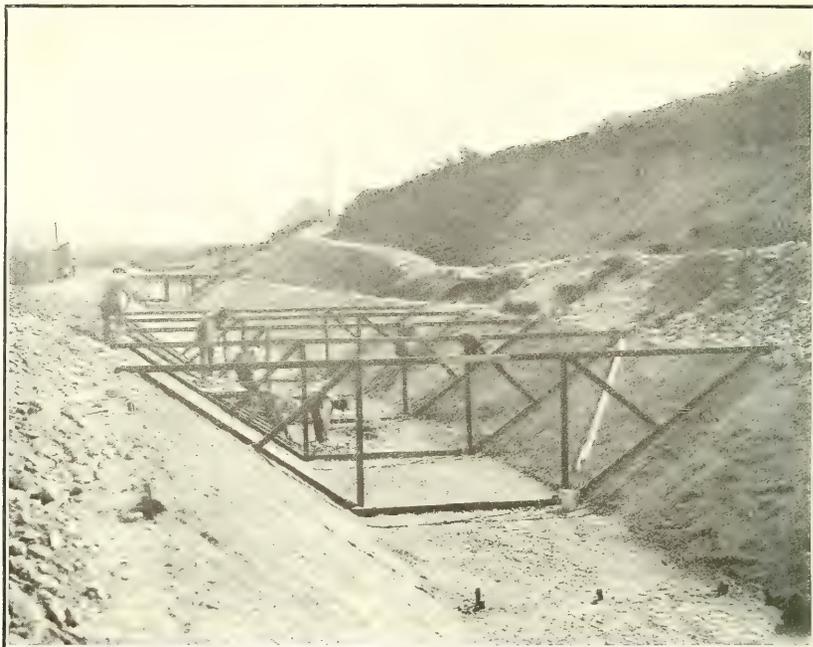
TEMPLATES USED IN PREPARING EARTH SECTION FOR CONCRETE LINING, RIDENBAUGH CANAL, BOISE, IDAHO.
